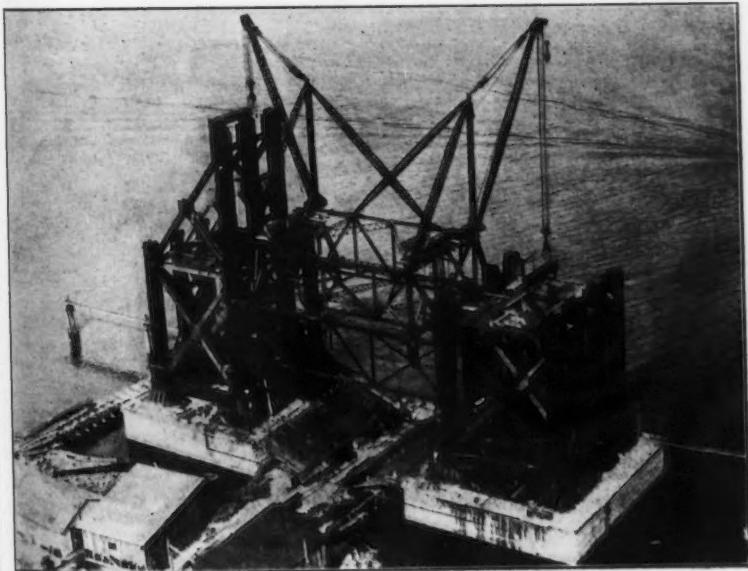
NEW JERSEY TOWER TRAVELER OPPOSITE PANEL POINT 1
